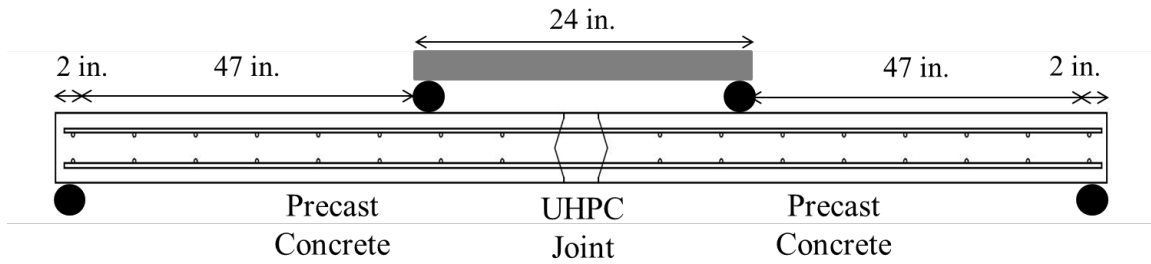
Four Point Bending Test Set Up for Flexure Test for Specimens F-100-1P-1, F-100-1P-2, F-100-2P-1 and F-100-2P-2
